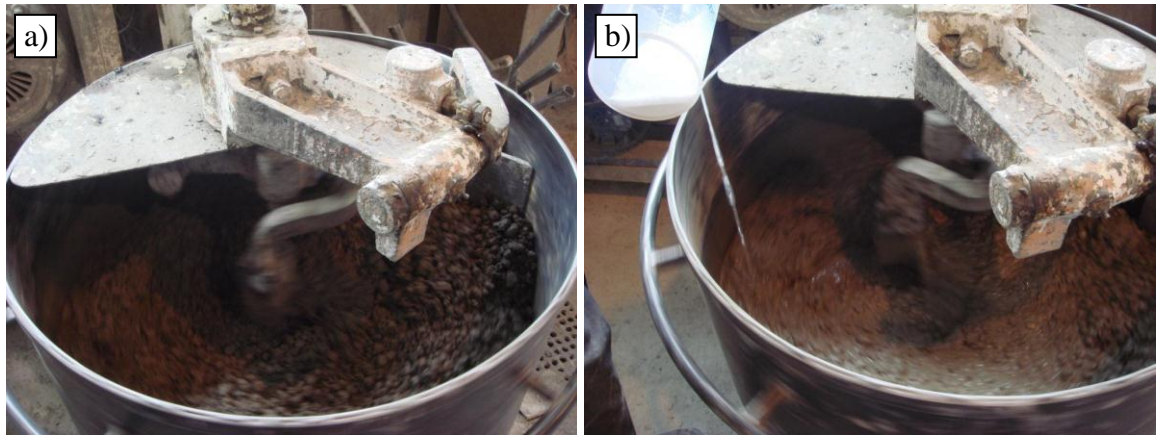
A typical concrete mix in the pan mixer; before adding SP (a) and after adding SP (b)
